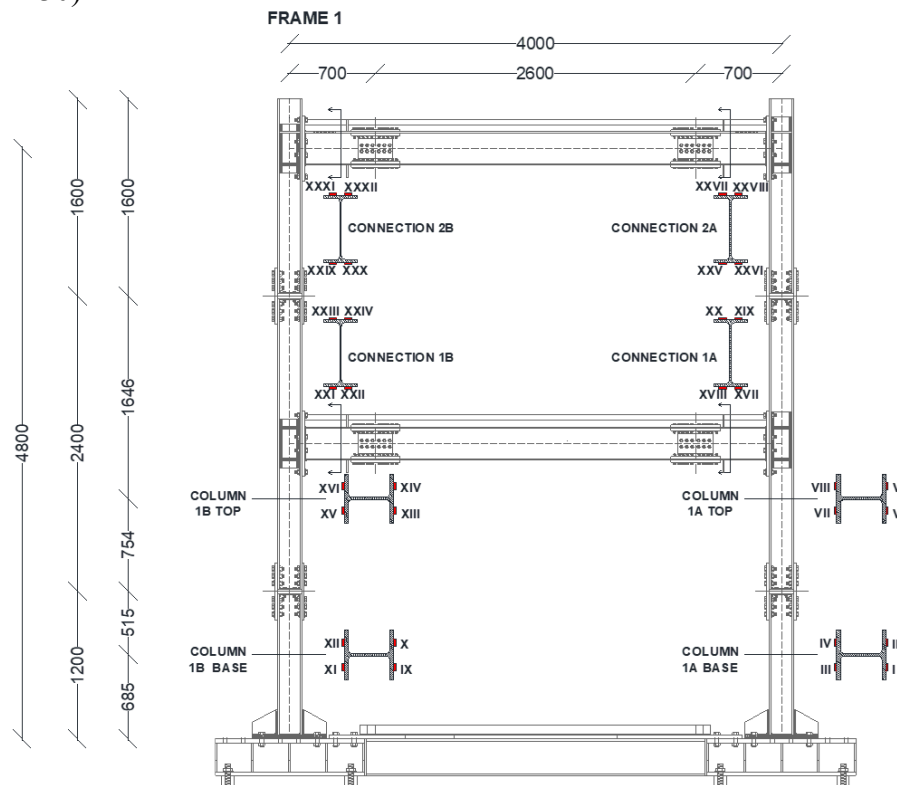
Layout of the strain-gauges applied on MRF-1 (structure equipped with RBSs)
